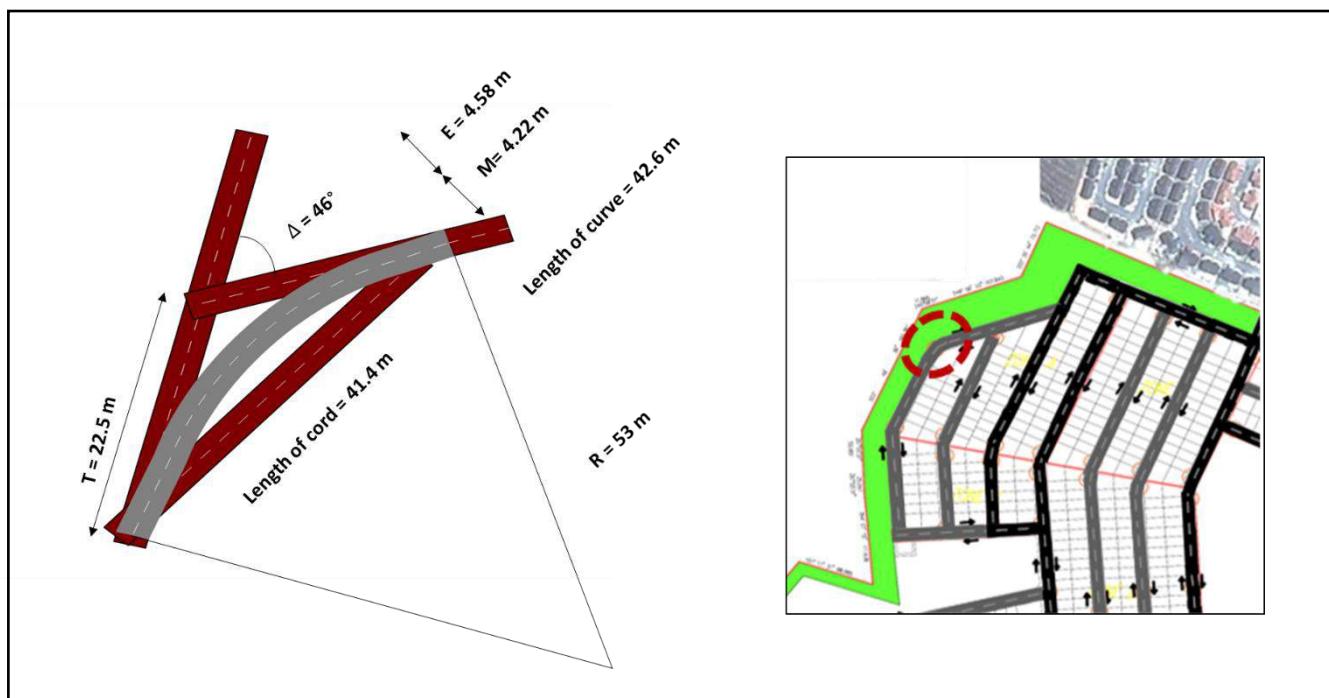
Proposed Horizontal Alignment at Study Zone A (Minor Road)
